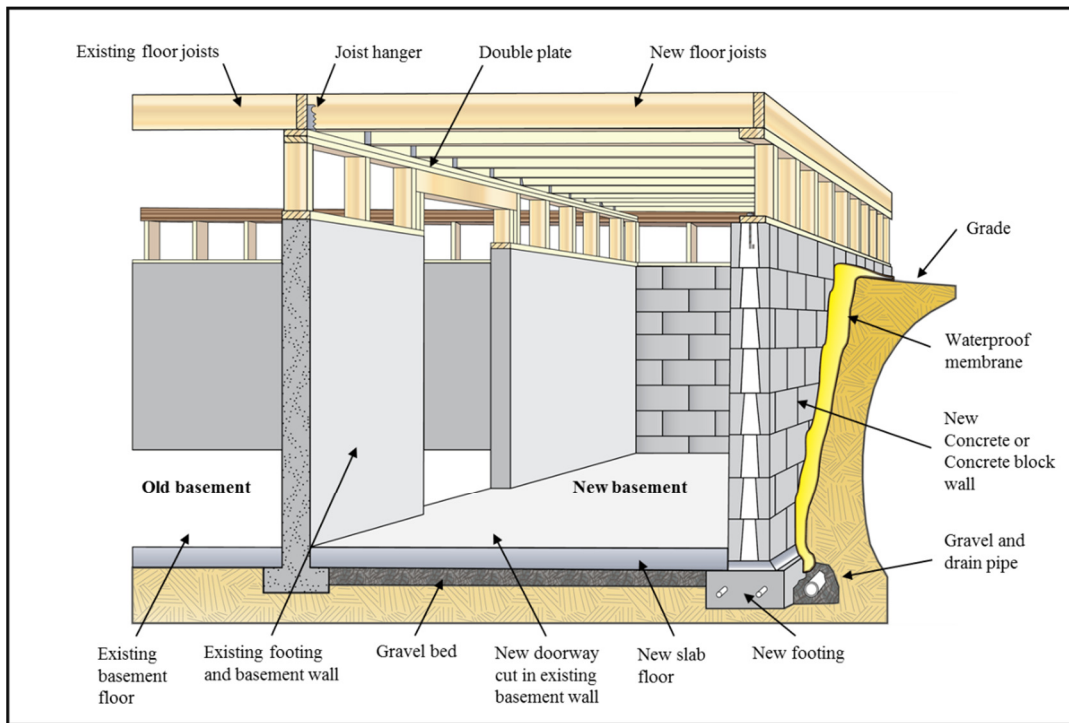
Basement Foundation (source: JWK Inspectors)
